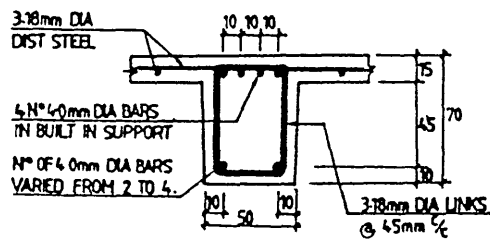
Typical Cross-Section of a Portion of Short Spanning Rib
